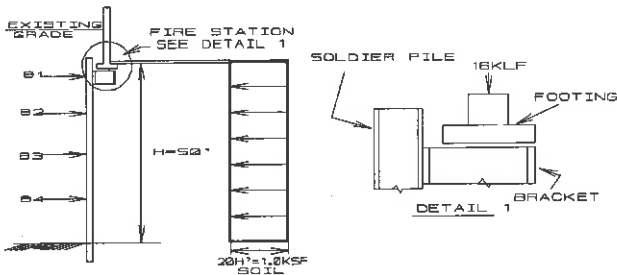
LOADING DIAGRAM FOR BRACKET PILES
